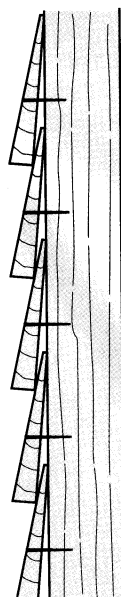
Design and fixing of cladding to avoid problems of shrinkage or swelling
